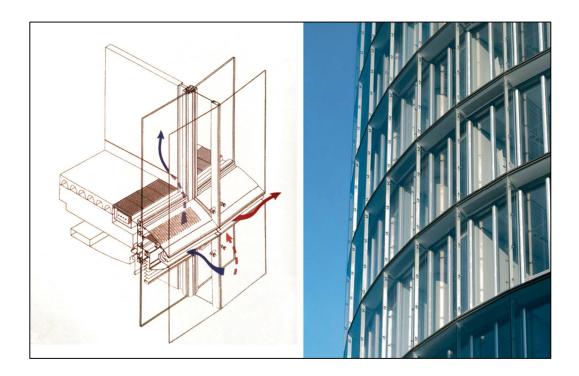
RWE Headquarters Tower – ventilation openings and close view of the facade (courtesy of Ingenhoven Architects)
